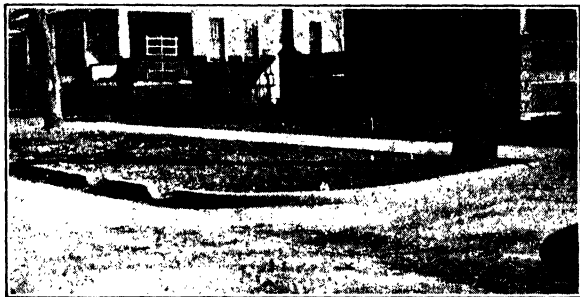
What happens when curb openings are not regulated. A well-built driveway side by side with two notches broken in the curb.
